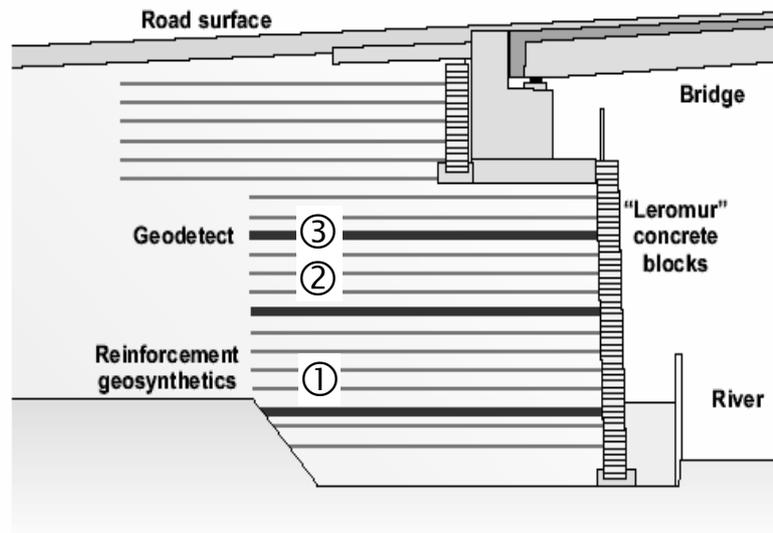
Cross section of the bridge abutment reinforced with geotextile in Saint-Saturnin and location of the 3 sensor strips.
